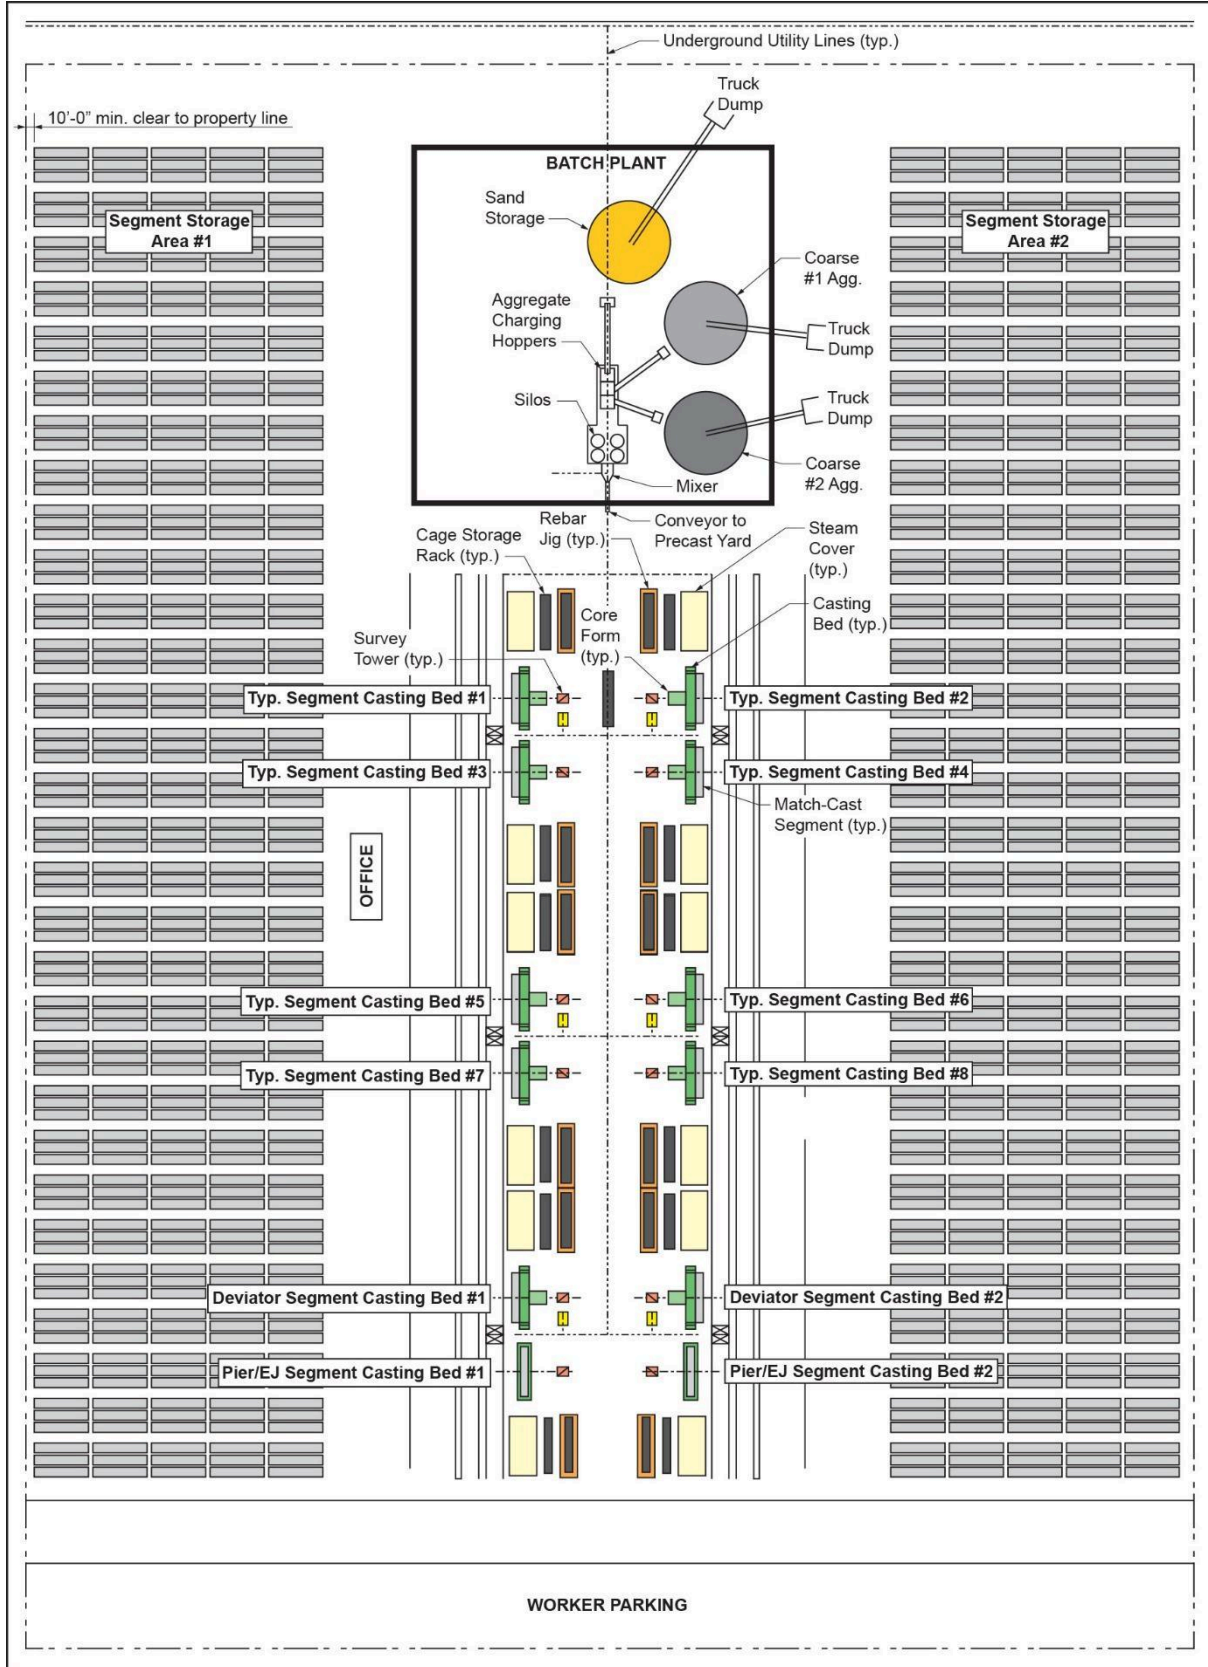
Typical Casting Yard Layout and Storage for the Short-Line Method
